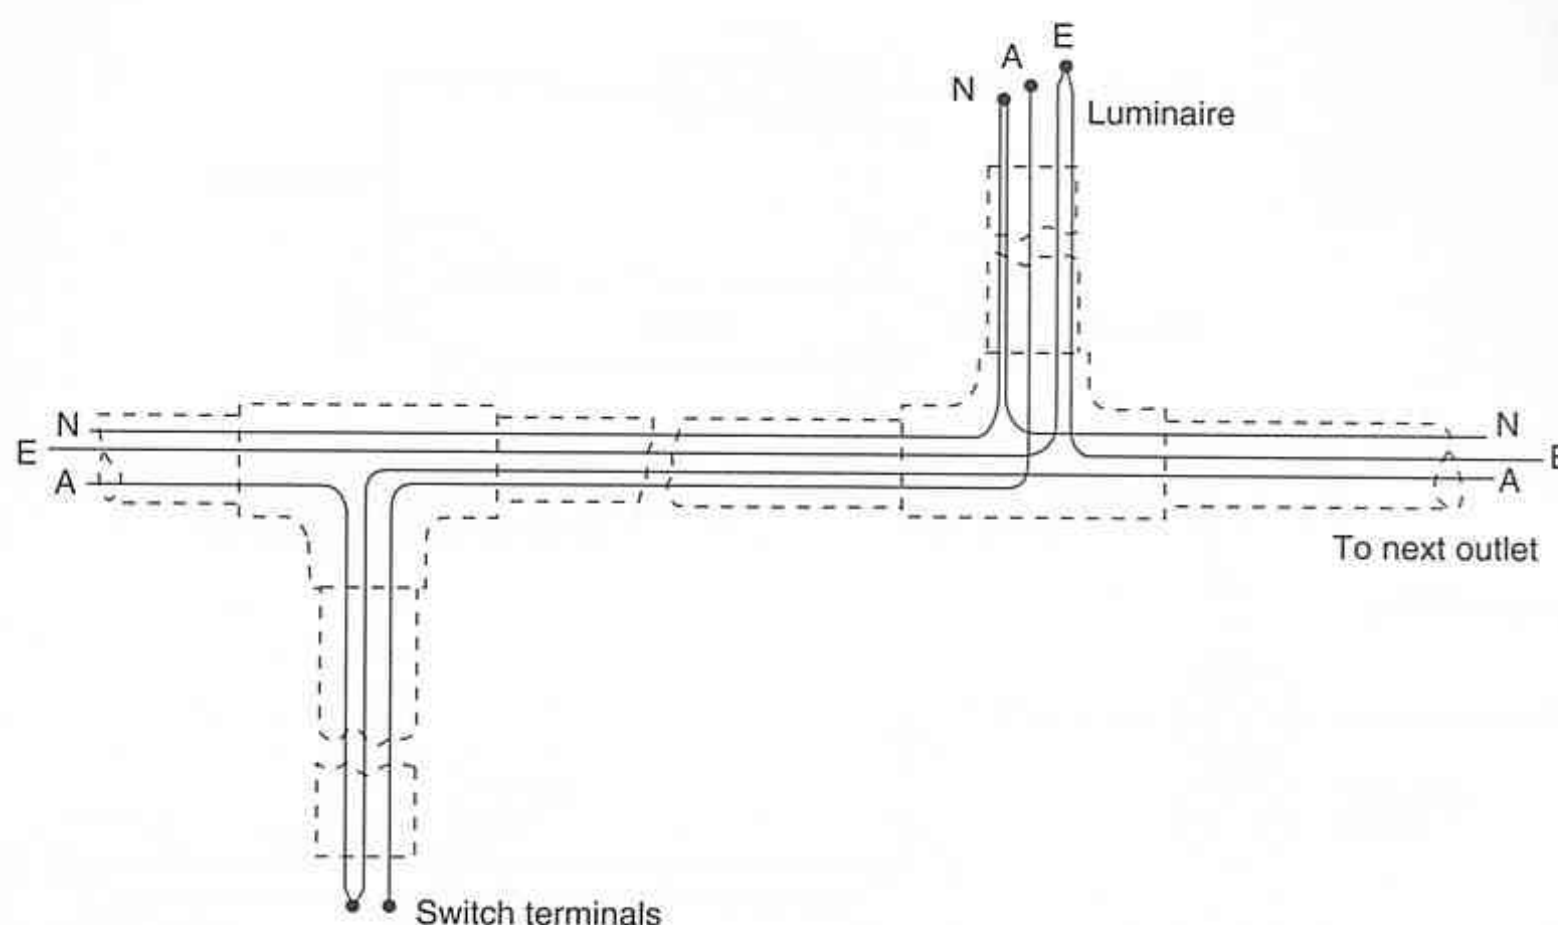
In this surface conduit system, actives are looped at the switch and neutrals or earths at the outlet or luminaire
